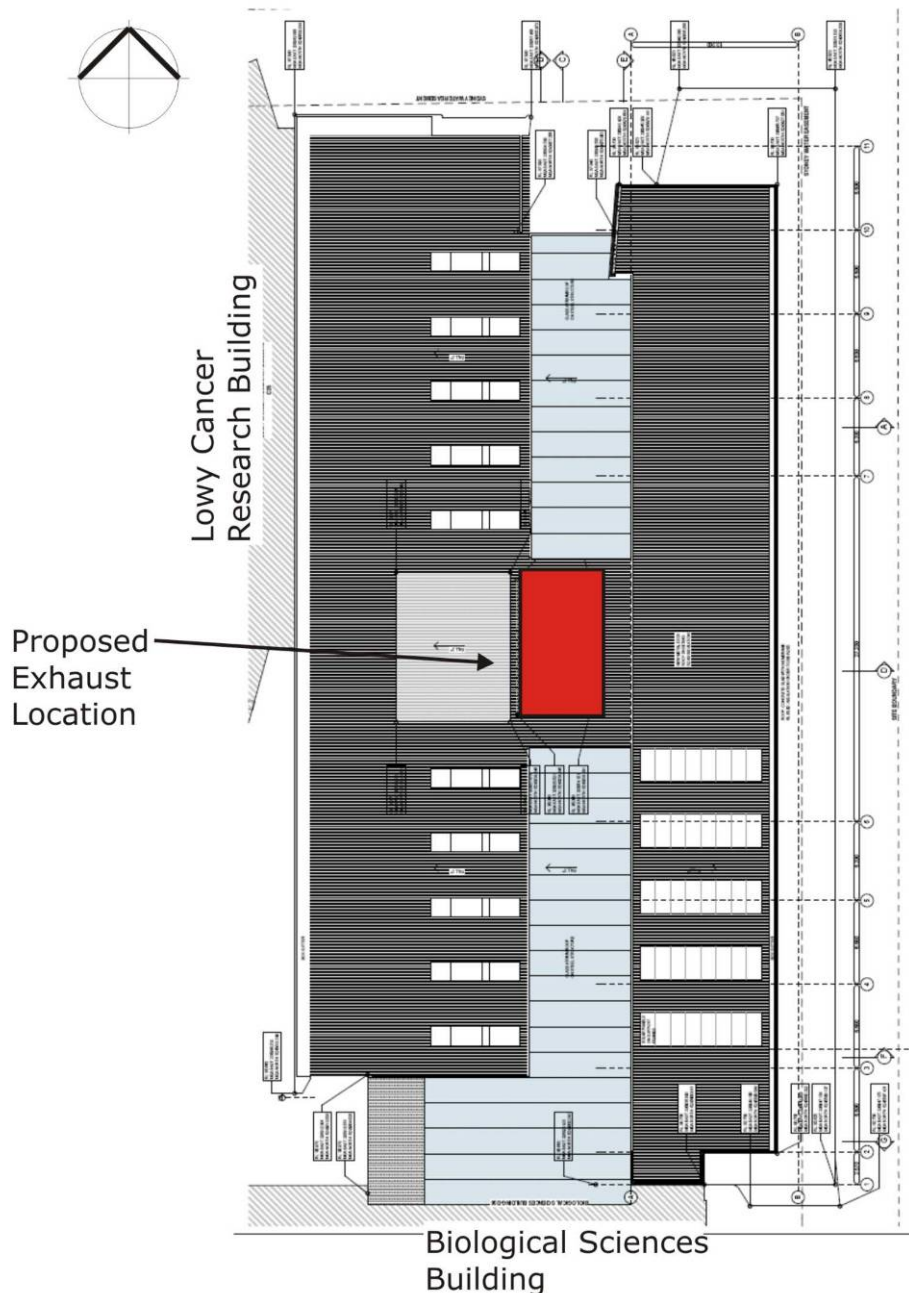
Plan view of Roof Level the proposed development including location of exhaust vent.
